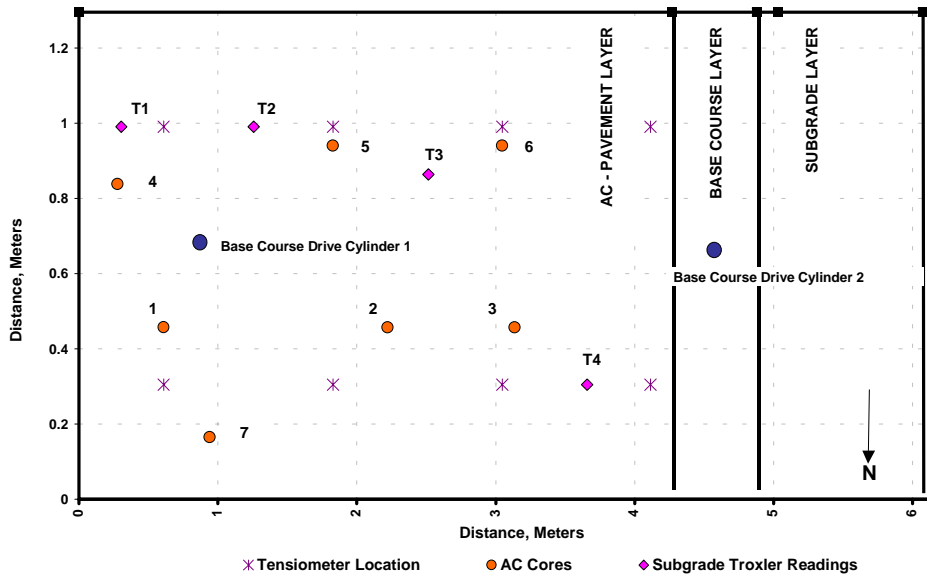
Plan view of test section showing locations of soil testing during deconstruction.
